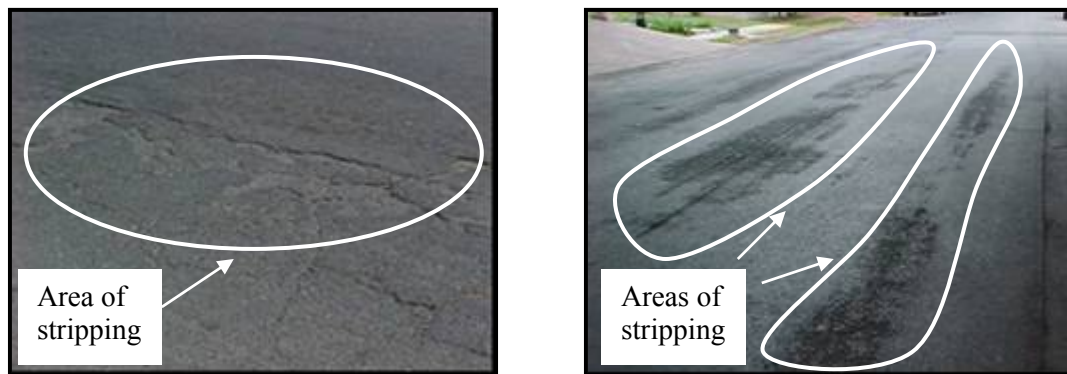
Examples of stripping in the form of raveling at the surface of the pavement
